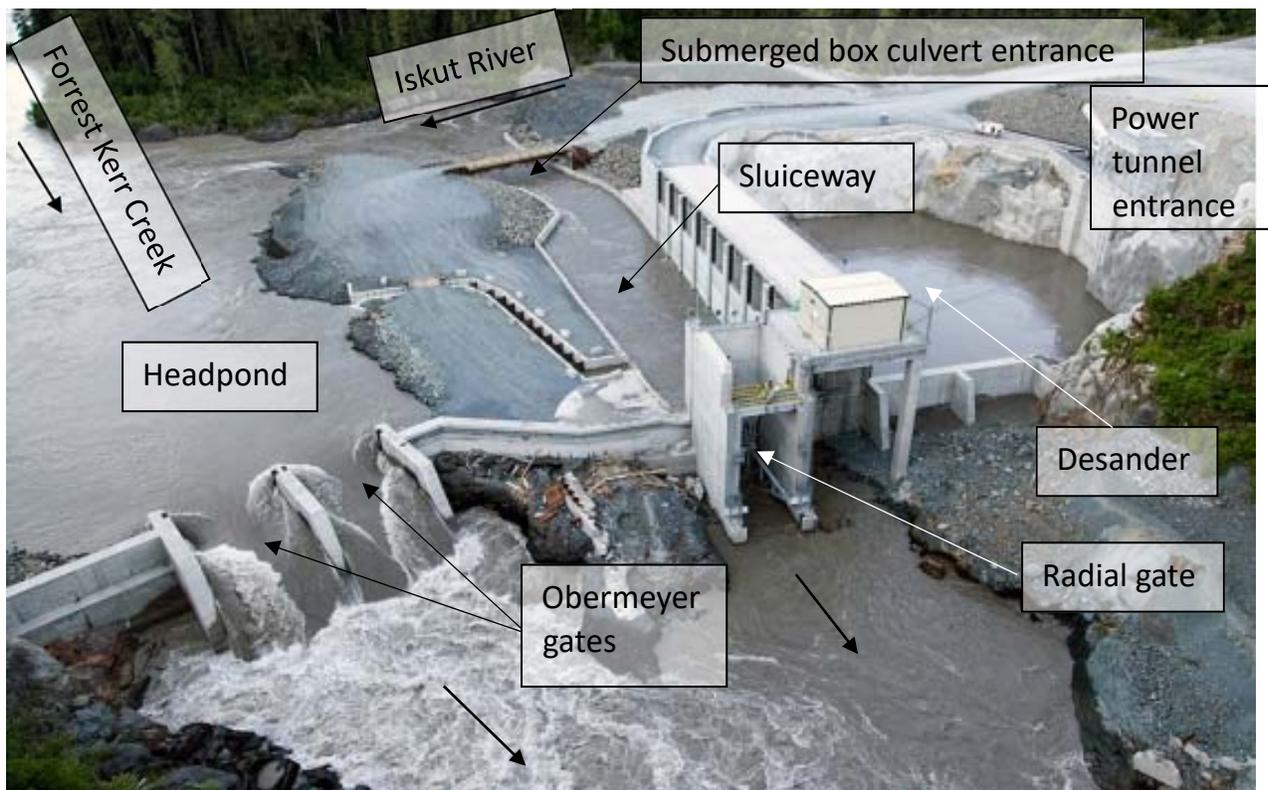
Aerial view of Forrest Kerr run-of-river facility (box culvert on the bottom of the sluiceway is fully submerged and not visible).
